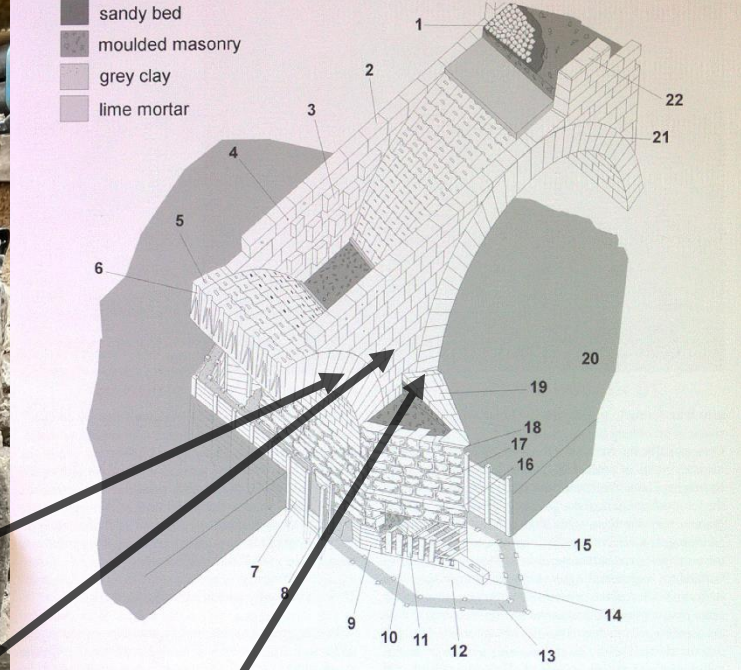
Roudnice nad Labem. Gothic bridge. Drawing of reconstruction of the structure of the pillar and the semicircular vault. 1) basalt boulder pavement 2) facing ashlars 3) bond-stone 4) slot for lifting mechanism 5) hole called 'vlčí tlama' or 'wolf's mouth' for attaching the metal lifting mechanism called 'vlk' or 'wolf' 6) ductules on the floor area of arch stones for distribution of mortar 7) supposed sheet-pile wall 8) sheet pile 9) crating of the horizontal grid 10) wooden floor 11) columns attached to the outer side of the horizontal grid 12) base of ballast 13) hypothetical limits of the reservoir 14) axial girder of the wooden horizontal grid 15) transverse anchorage of planks 16) offset of the pillar 17) bossed ashlar of the pillar 18) ledge of the mouth of the pillar 19) roof of the mouth of the pillar 20) water level 21) the top arch stone of a segment of the semicircular vault 22) handrail of the bridge. Drawing: M. Cihla.
